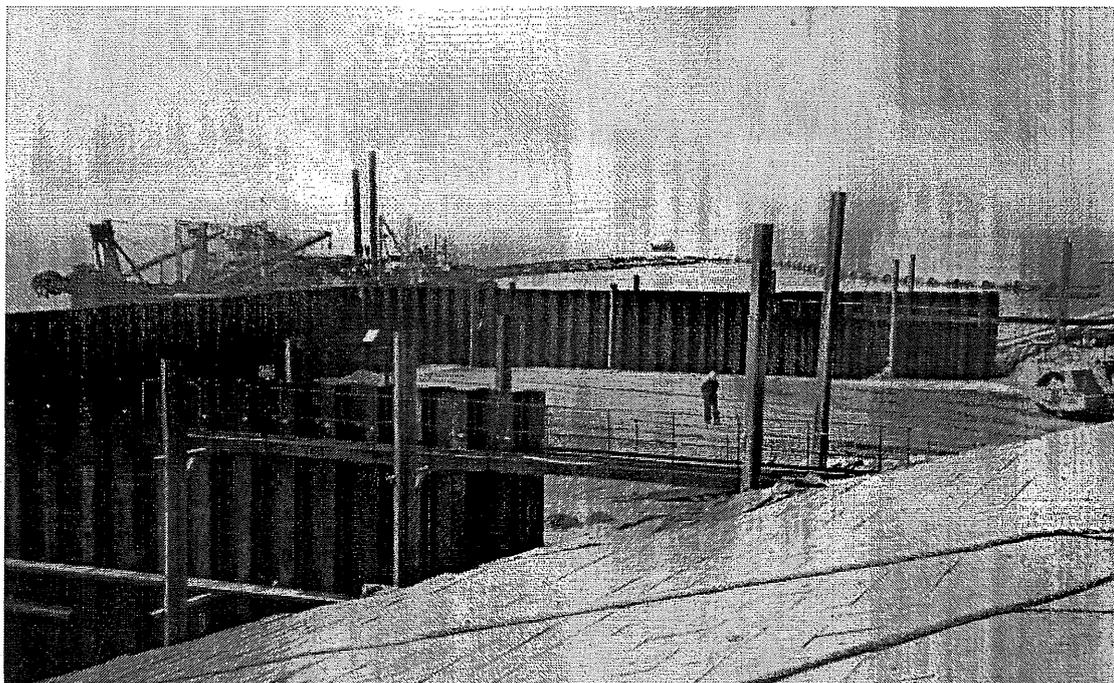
Unrestrained armoured slope face and sheet-piled jetty.
